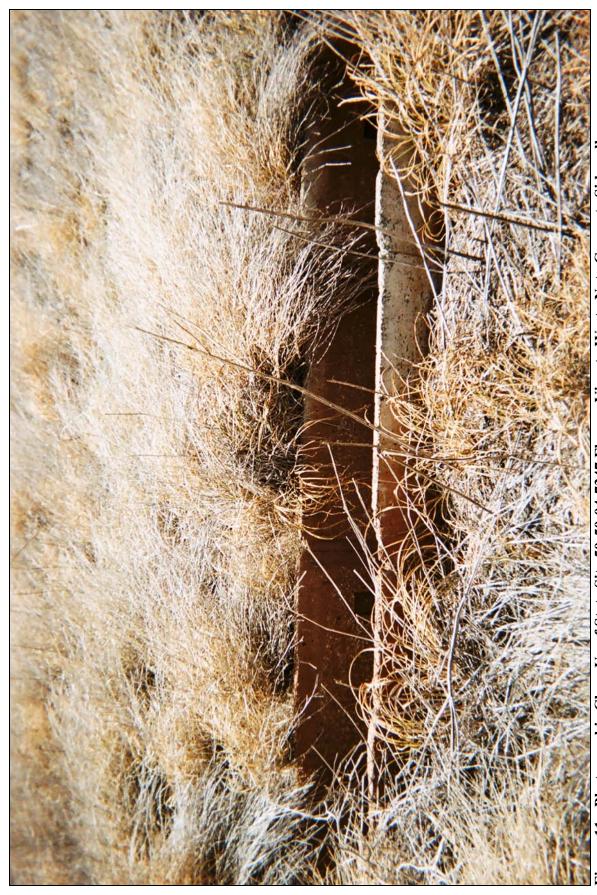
Photographic Close-Up of State Site 50-50-04-7347 Flume. View to West. Note Concrete Sidewalls.
